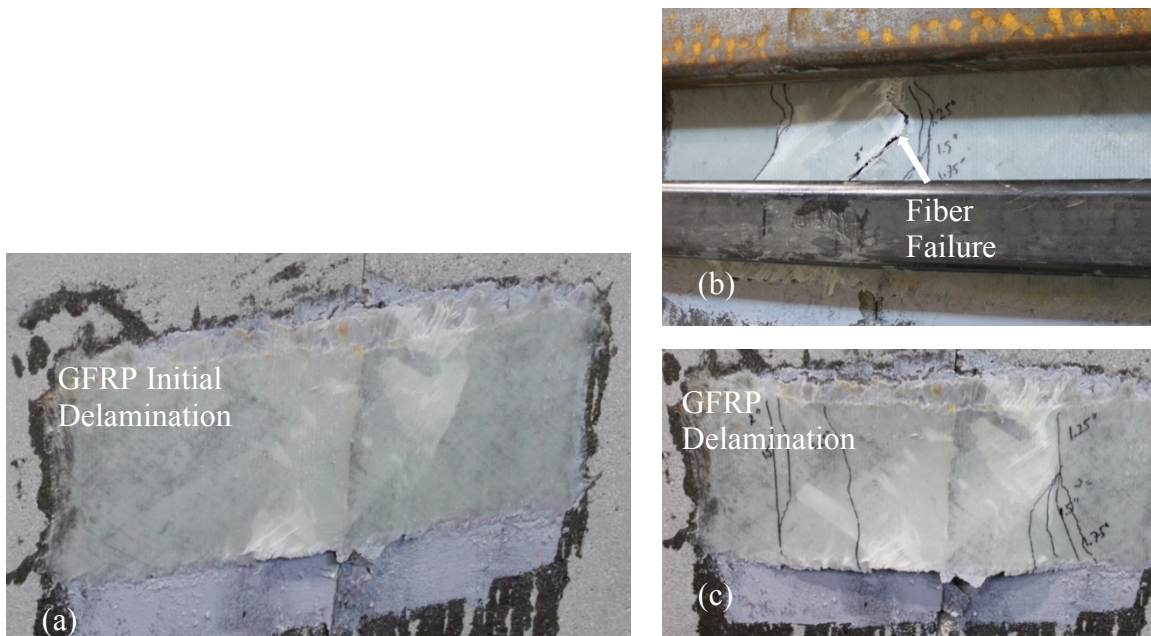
Test #5: (a) lower connection initial delamination; (b) upper connection failure; (c) lower connection failure.
